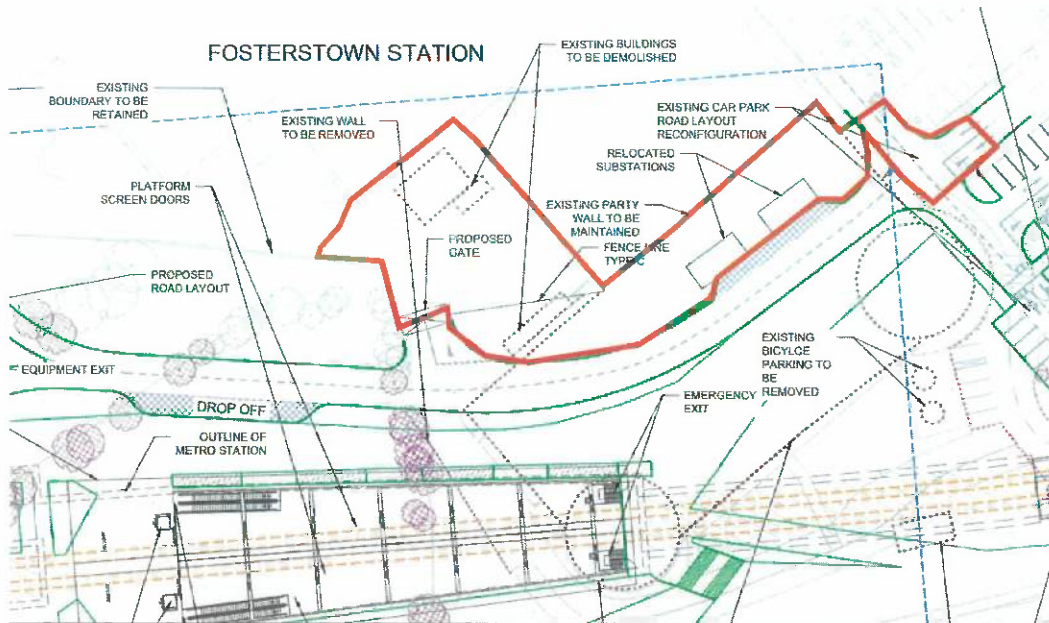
Approximate extent of lands which should be returned to our clients post-construction (in red) – extract from route layout plan
